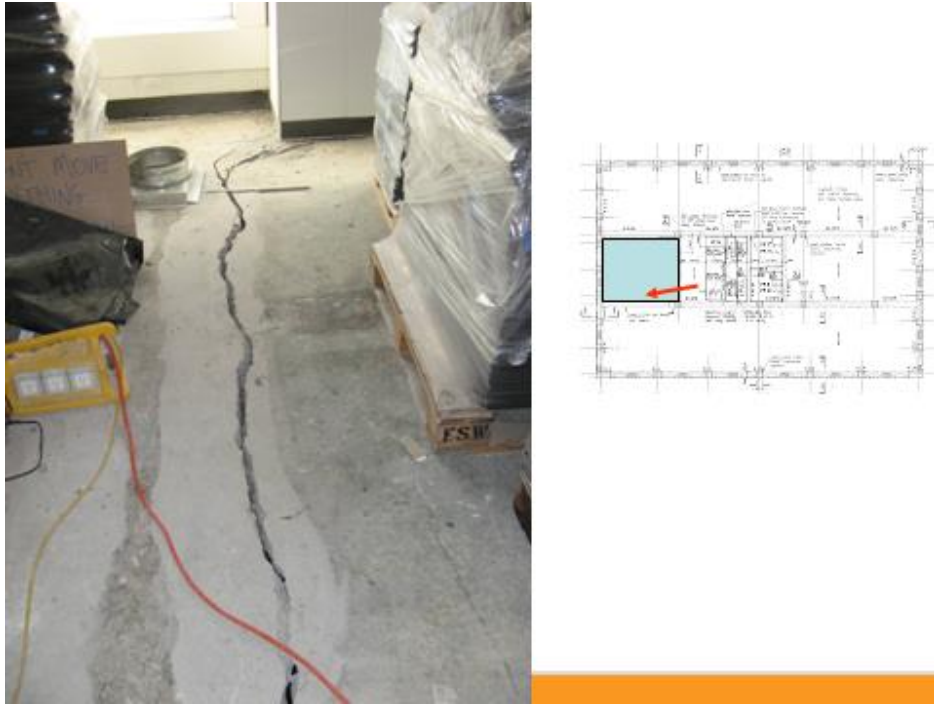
Photo of crack in floor due to elongation in the Clarendon building (Source Holmes Consulting Group)
